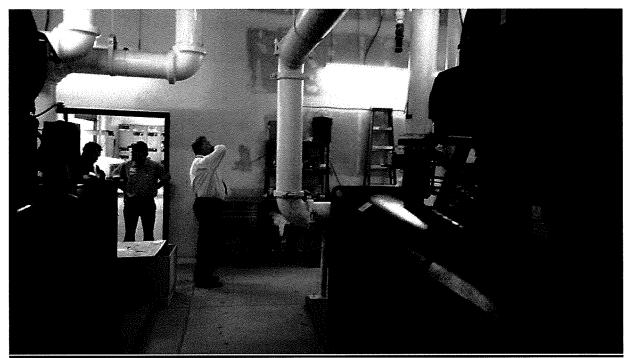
Existing CH-1 on right, CH-2 to left. Note lack of opening to move CH-1 in/out of the mechanical room. The wall behind the photographer in this photo is masonry.
